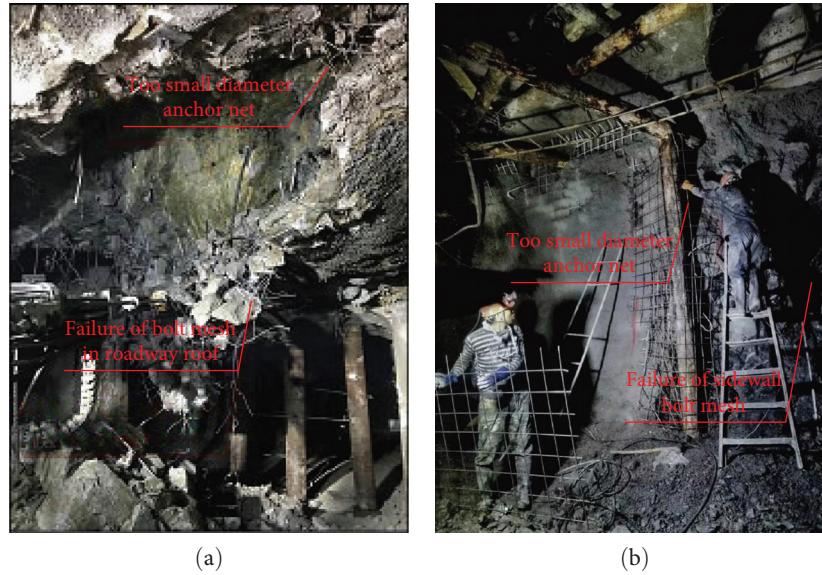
Failure diagram of roadway with insufficiently large bolt net reinforcement diameter: (a) failure of bolt mesh in roadway roof; and (b) failure of side wall bolt mesh.
